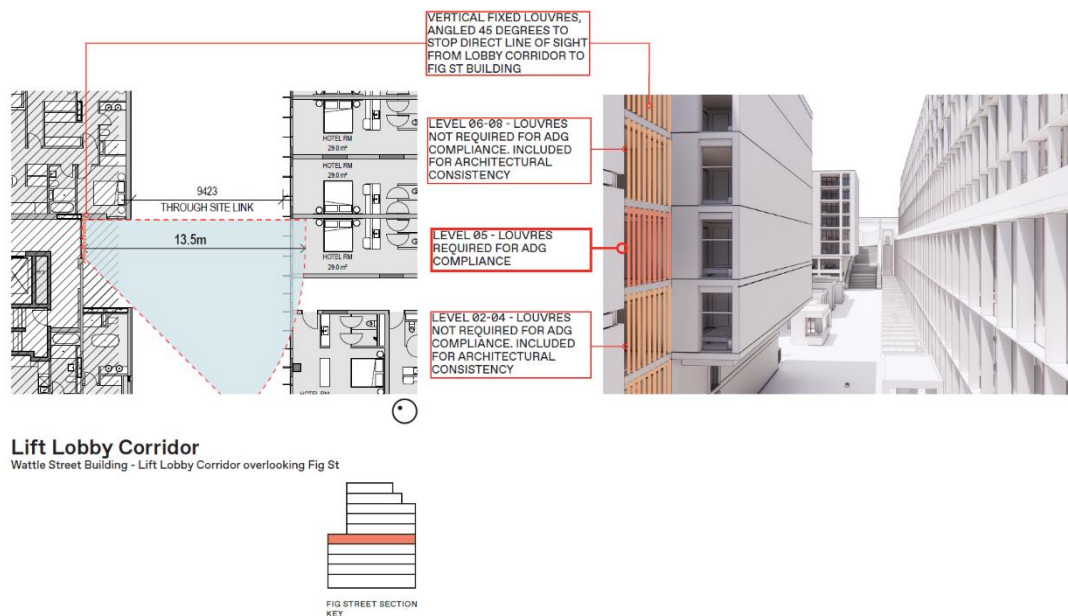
Privacy protection measures - Louvres: Fig Street Building to Wattle Street Building
